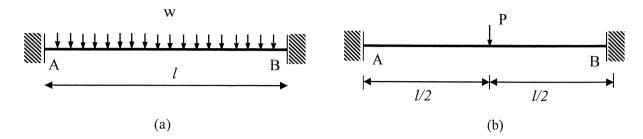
Fixed supported beam with: (a) a uniformly distributed load; (b) central point load
